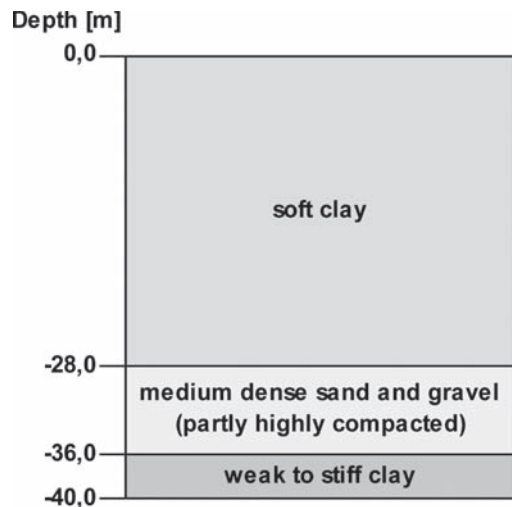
Soil conditions Hanjin Expressway, Osaka, Japan.
